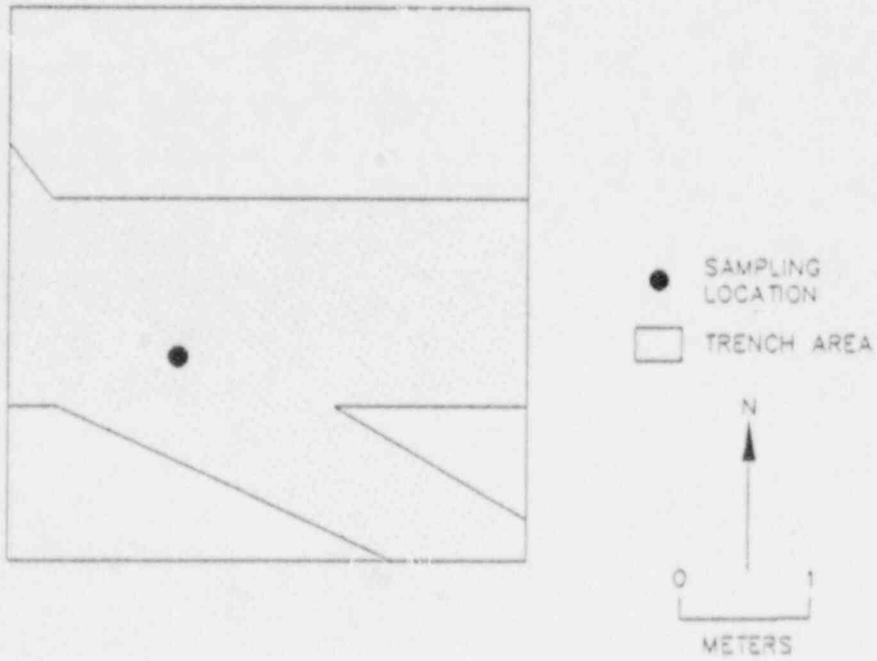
Room 3 Showing Trench Soil Sampling Location
